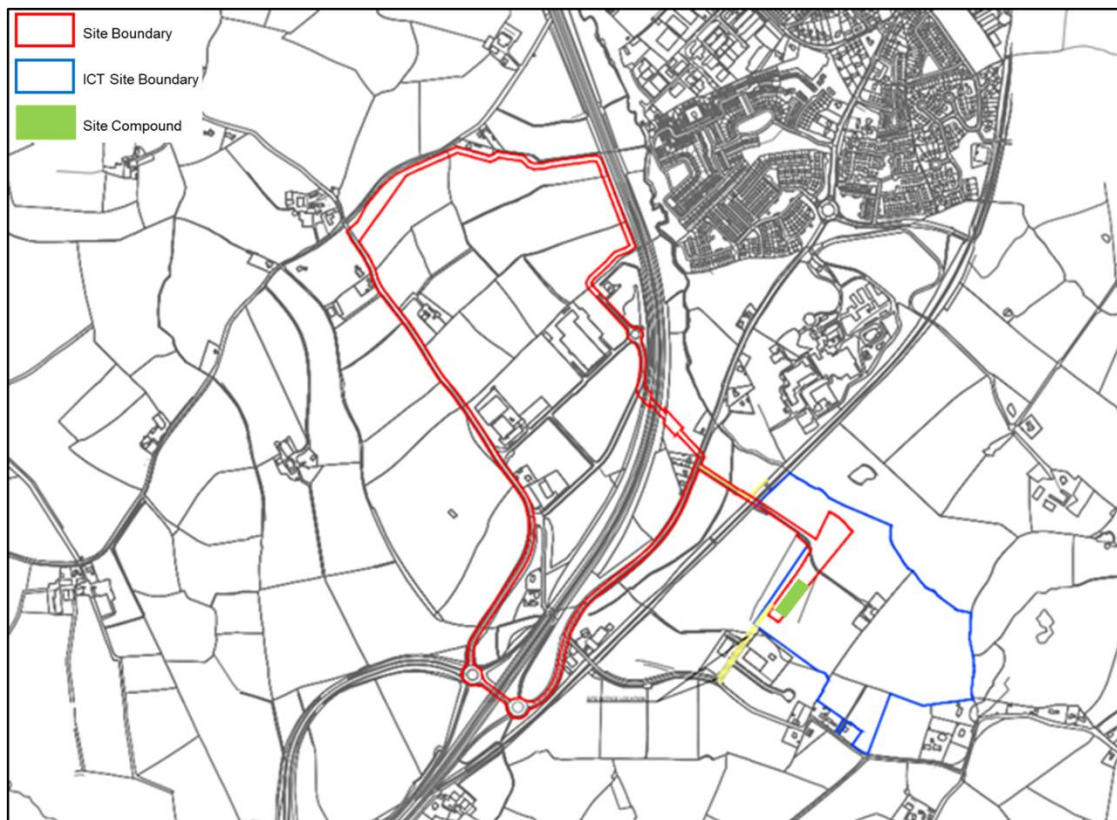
Proposed site construction compound location (incl. site offices, staff facilities and refuse storage).
